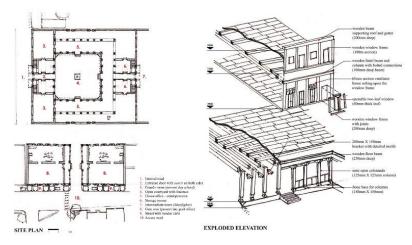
Case Example 2: Raste Wada, Rasta Peth: Plan and Exploded Elevation showing the Materiality and Construction Details
